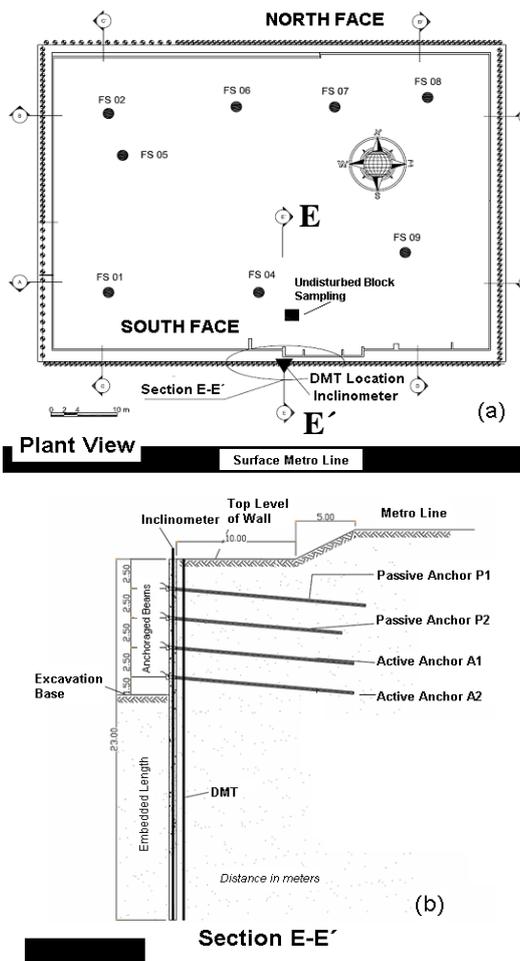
(a) Plant view of the several faces of the retaining wall and (b) Cross section of studied region.
